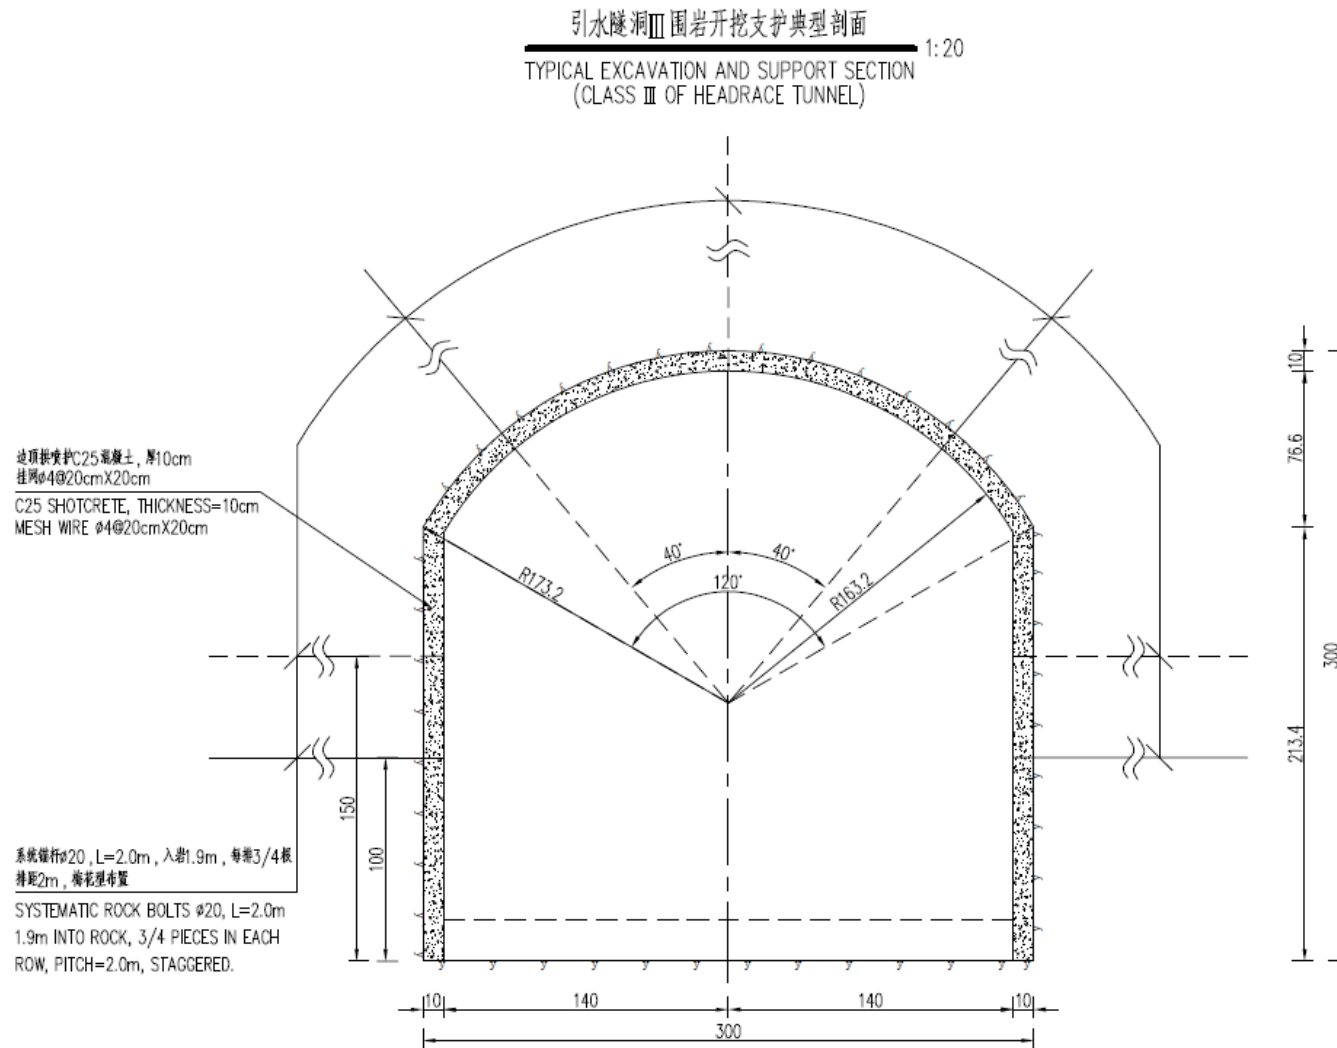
Cross-Sectional View of HRT (Source: Detail Design Report 2021)
